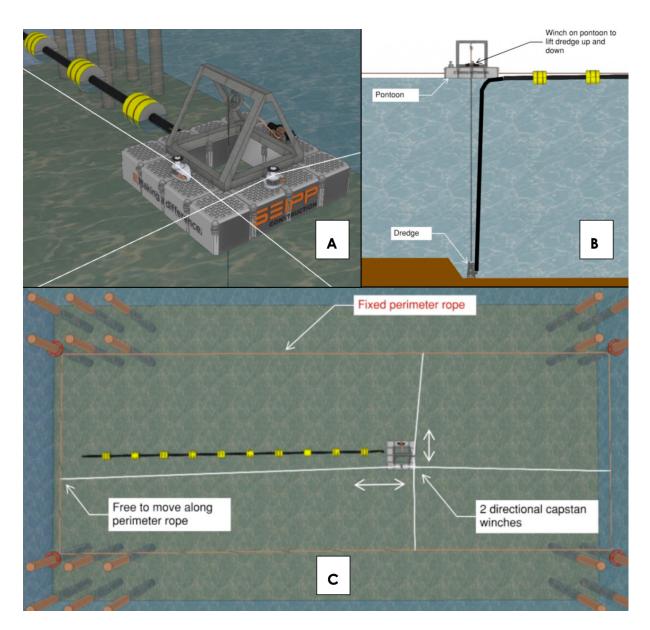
A) Example dredging pontoon, B) vertical suction head profile, and C) plan-view lateral movement configuration.
